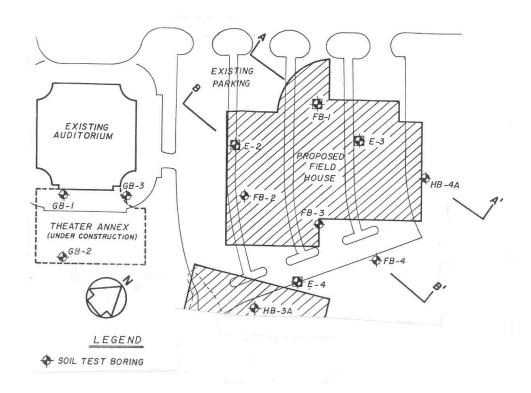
Representative Test Location Plan of Completed Soil Boring Locations. (Note: Horizontal Scale: 1 cm = 10 meters)
